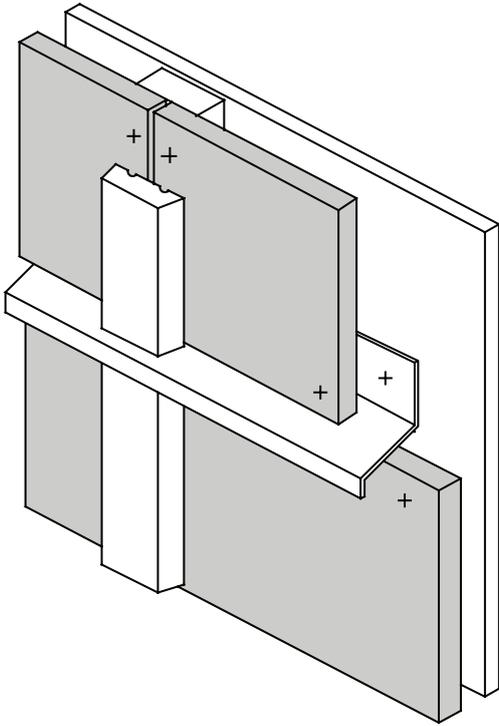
Vertical joint with timber cover battens and horizontal joint with preformed metal flashing
